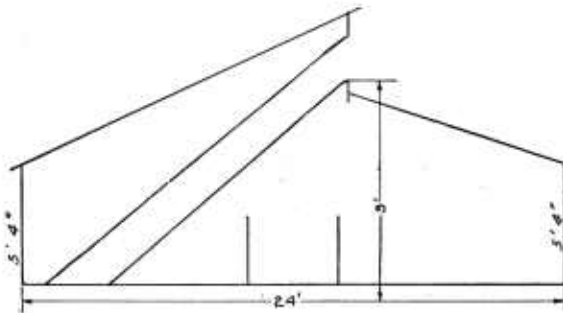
Cross section of house shown in figure 7, showing where sunshine from upper windows will fall at 10 a. m. and 2 p. m. March 1.
